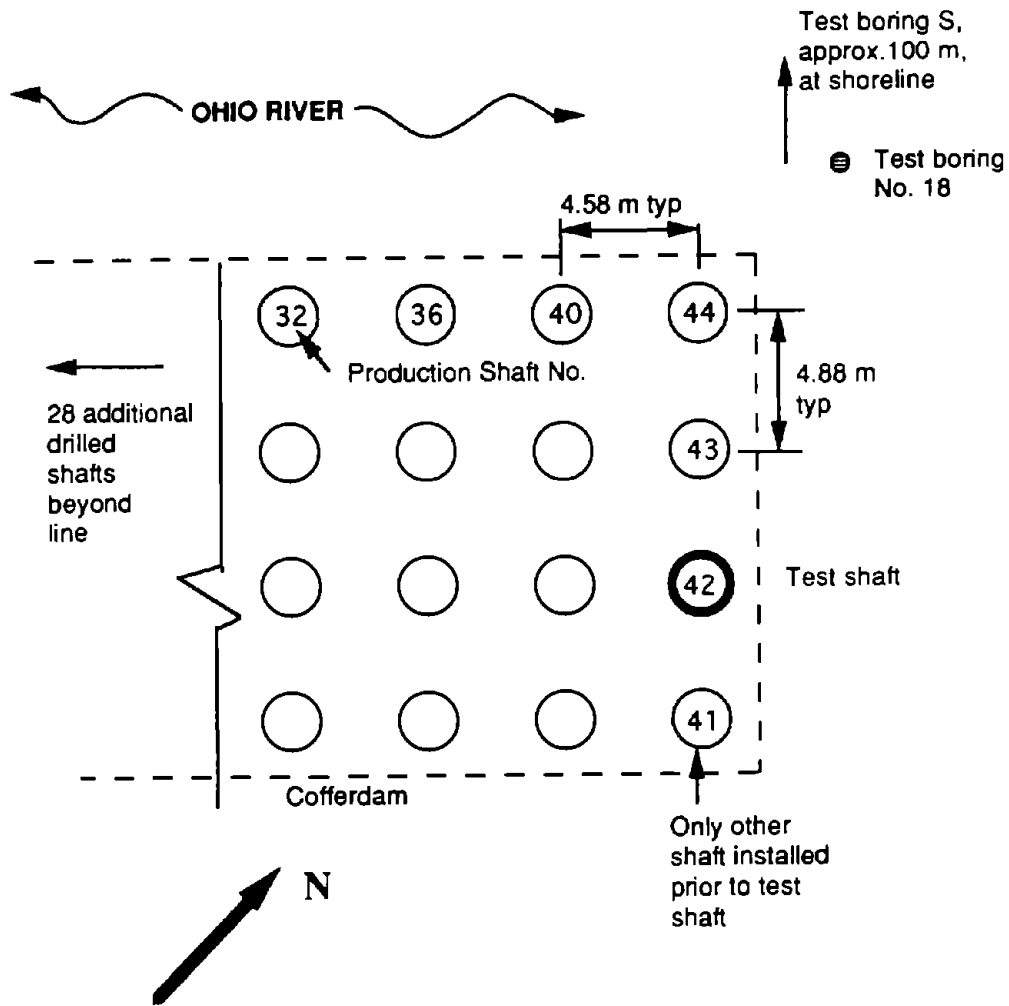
Layout of test and production shafts for Pier 9, Owensboro site.
